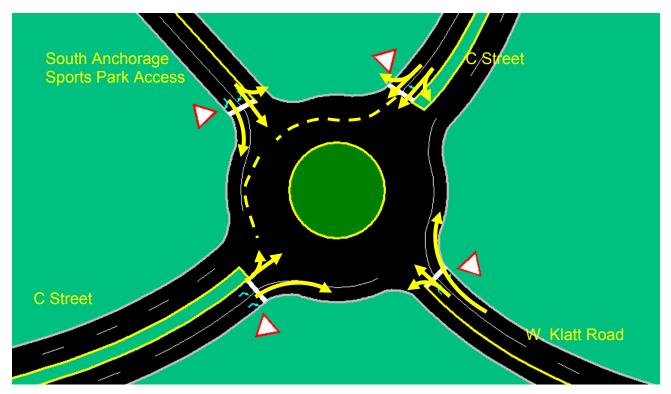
C Street /Klatt Road Modern Roundabout Concept
